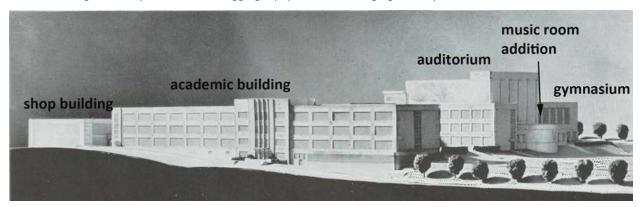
Model of George Washington High School showing the music room addition as it was originally designed.
